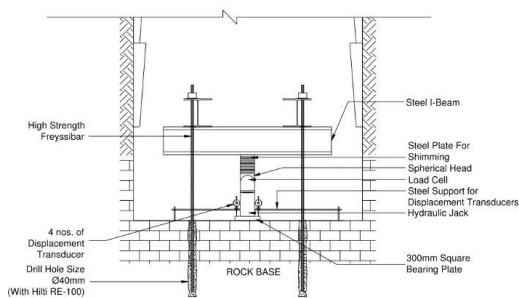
Modified caisson plate bearing load test set-up with reaction anchor
